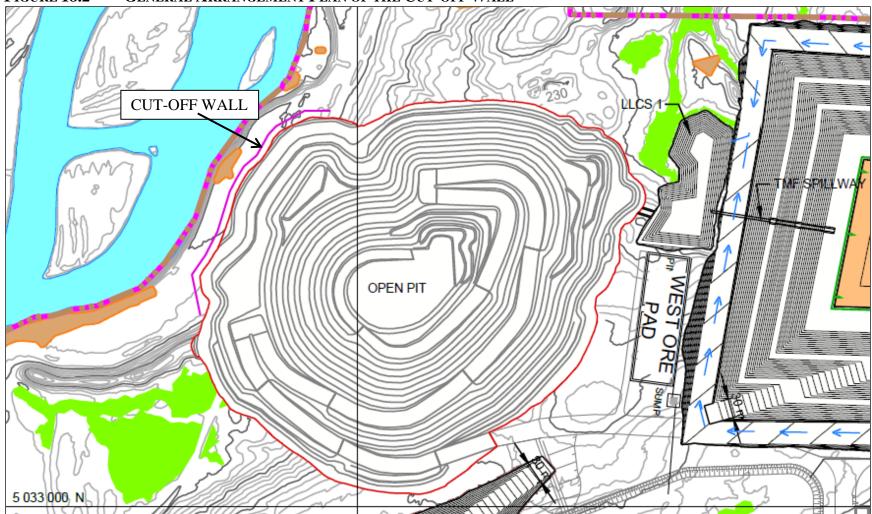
GENERAL ARRANGEMENT PLAN OF THE CUT-OFF WALL
